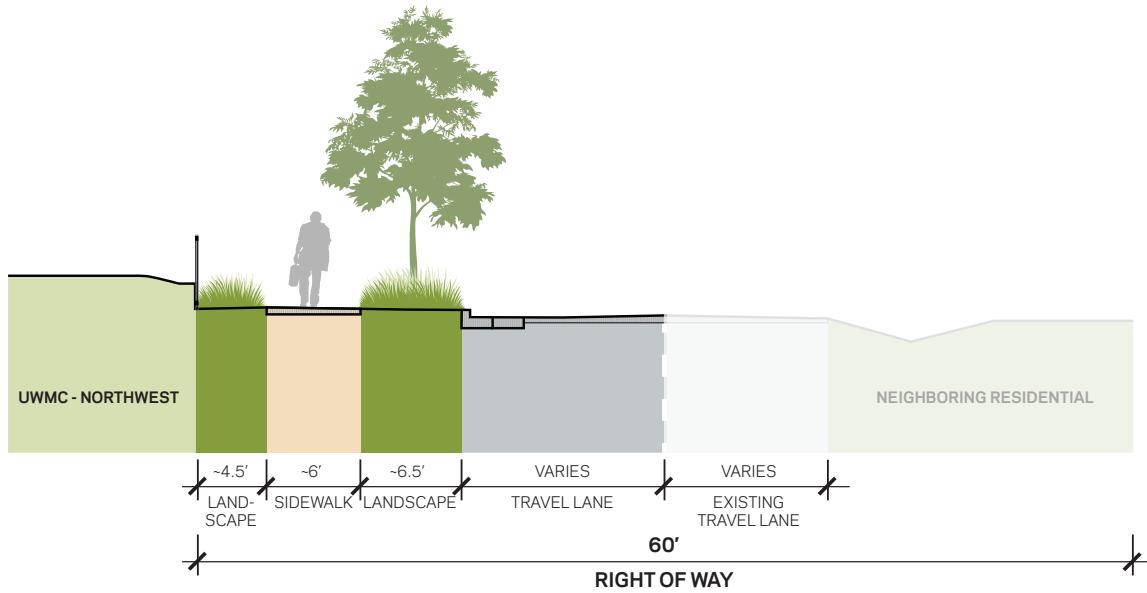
STREET SECTION AT N120TH ST - NORTH CAMPUS EDGE
